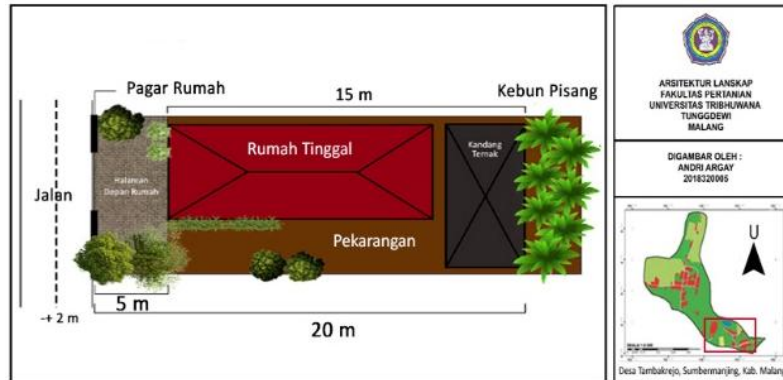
Site Plan of Residential Area in the Southern Part of Sendang Biru Hamlet
